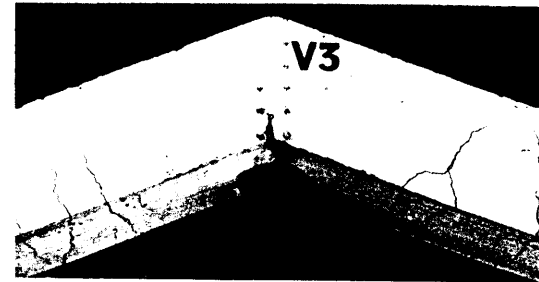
Bending Failure in Beams while Corner Remained Intact
